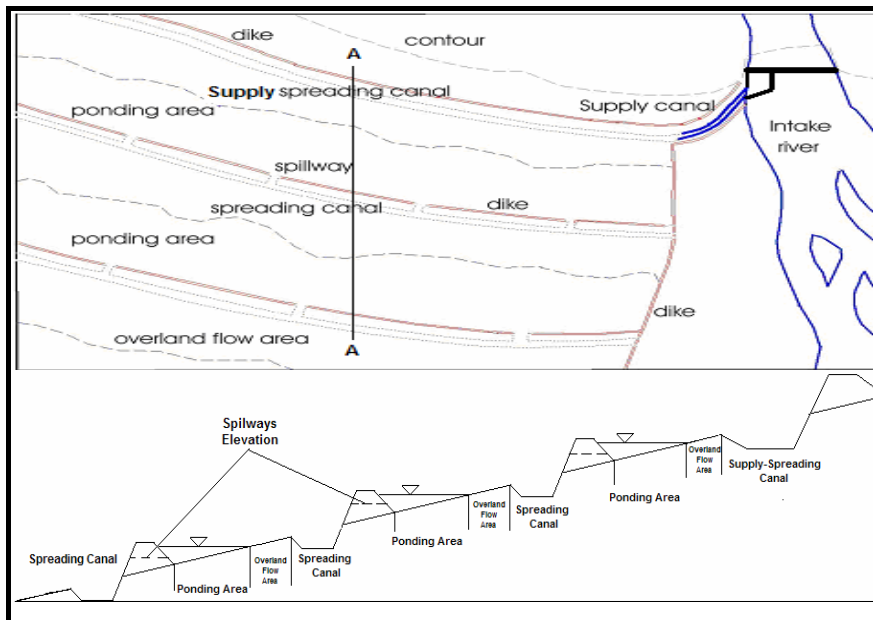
Schematic plan and cross section (A-A) of canal and basin type of floodwater scheme
